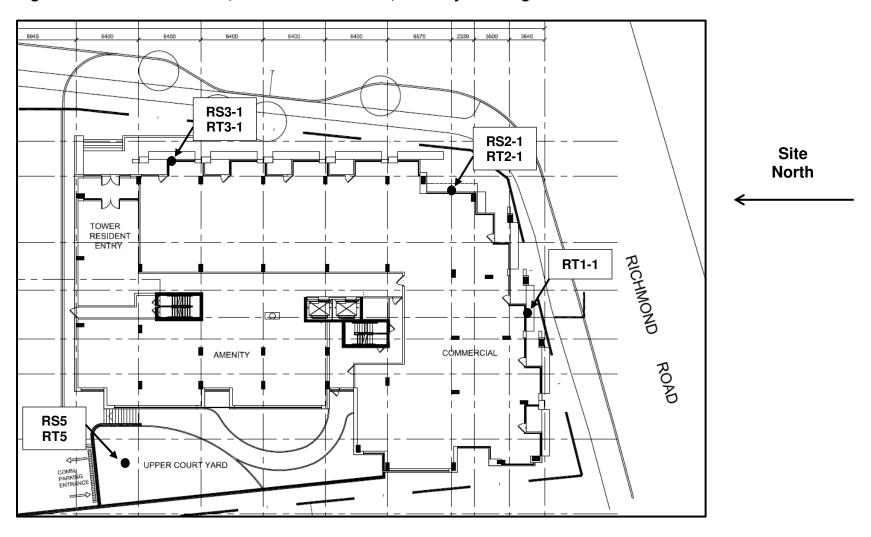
2<sup>nd</sup> Floor Plan, 175 Richmond Road, 9-storey Building
